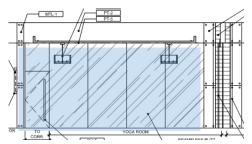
| Level 1 Floor Plan - Fitness Center + Yoga Room
